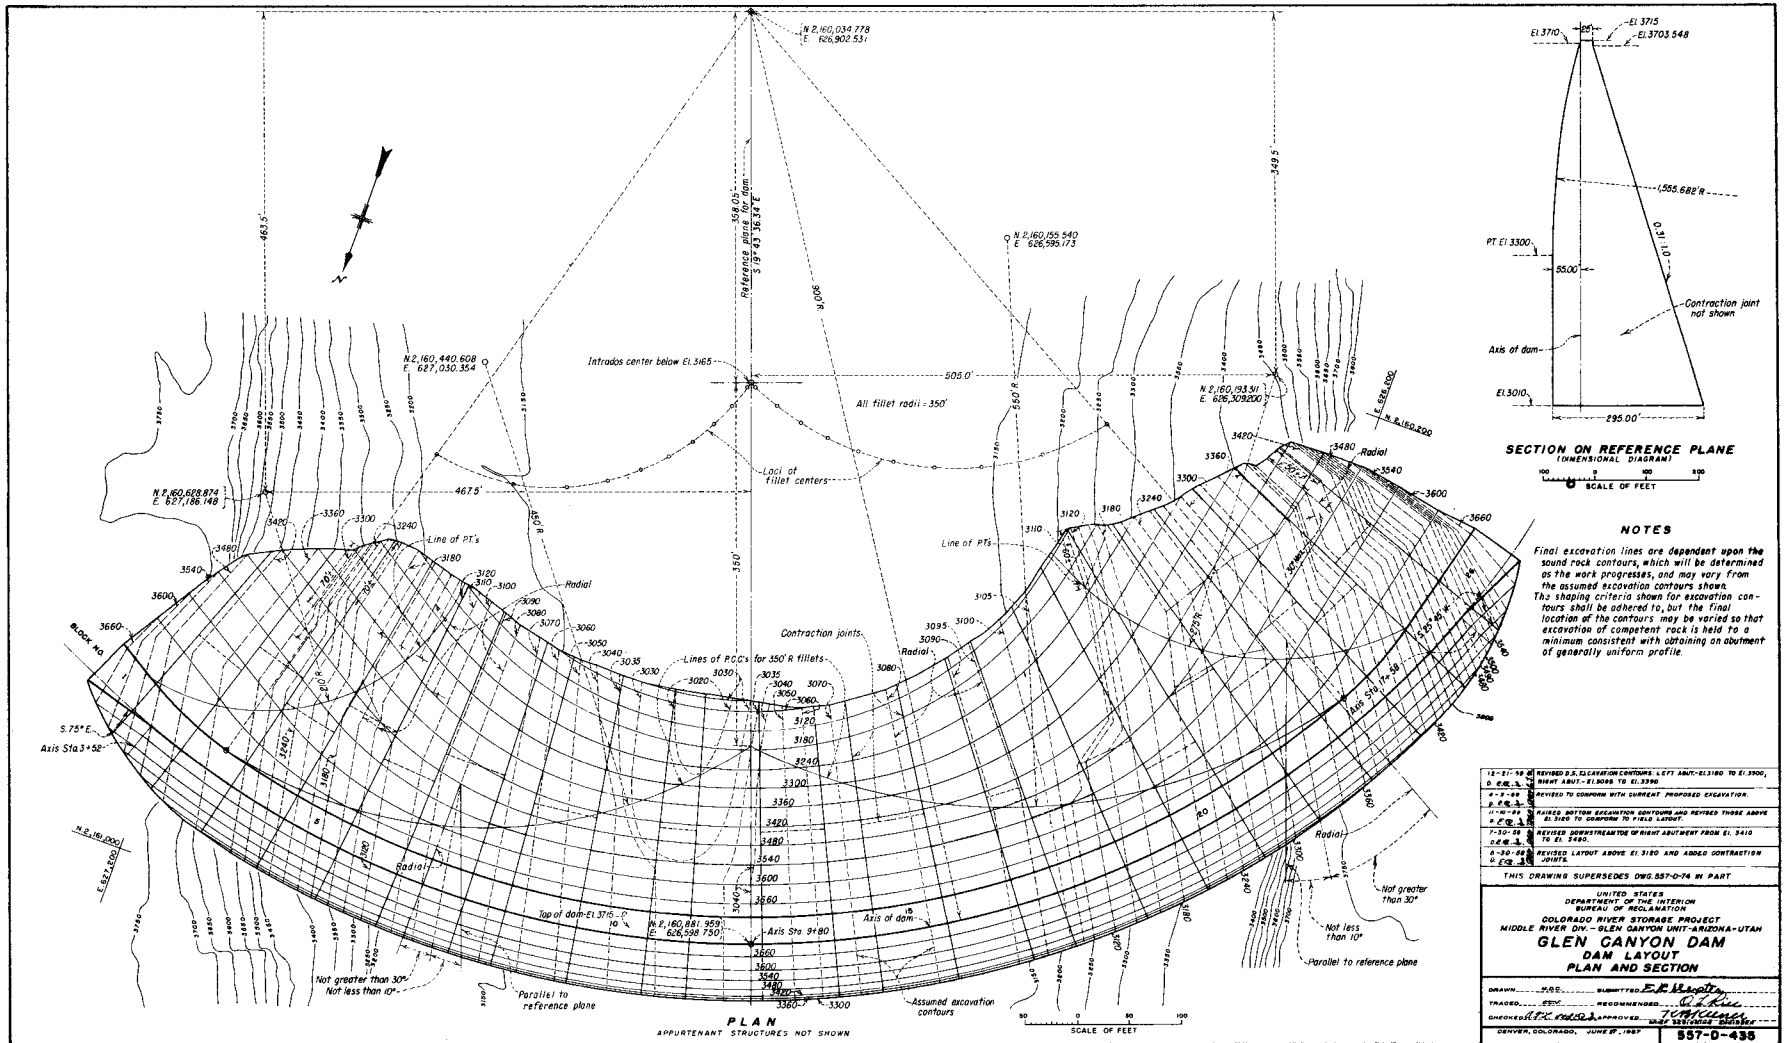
Dam layout for study A-20—Plan and sections. This layout was based on final abutment excavations.
